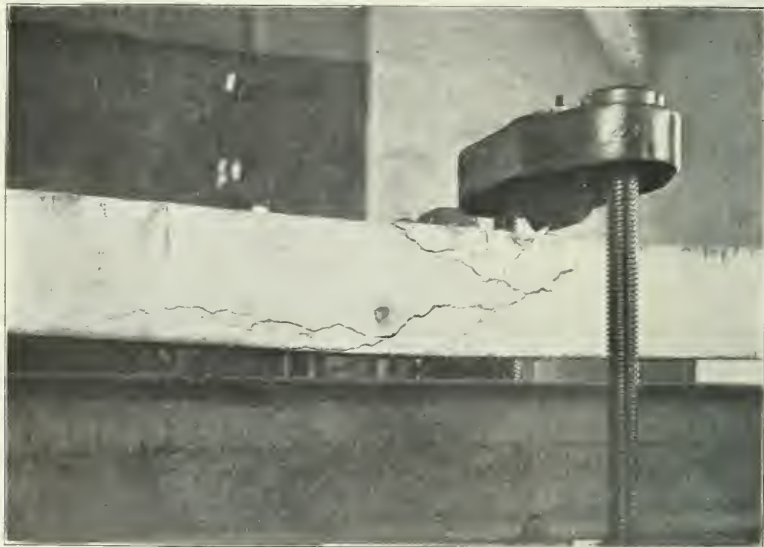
REINFORCED CONCRETE BEAM, JUST BEFORE COLLAPSE.
